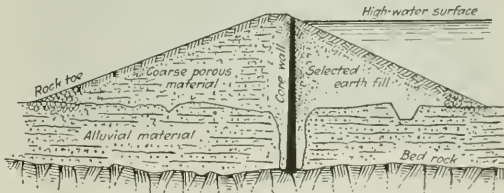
CROSS-SECTION OF EARTH DAM WITH COREWALL
